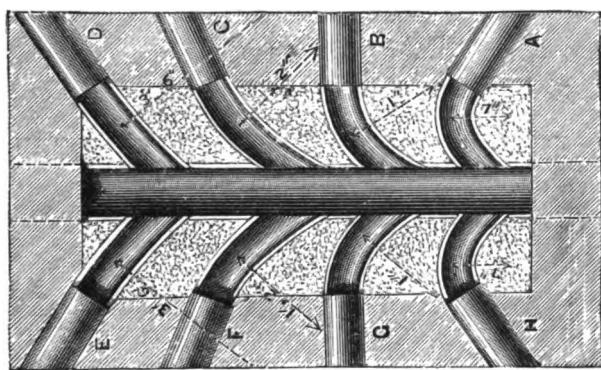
Plan of manhole chamber, showing eight separate branch drains joining main drain at various angles.
